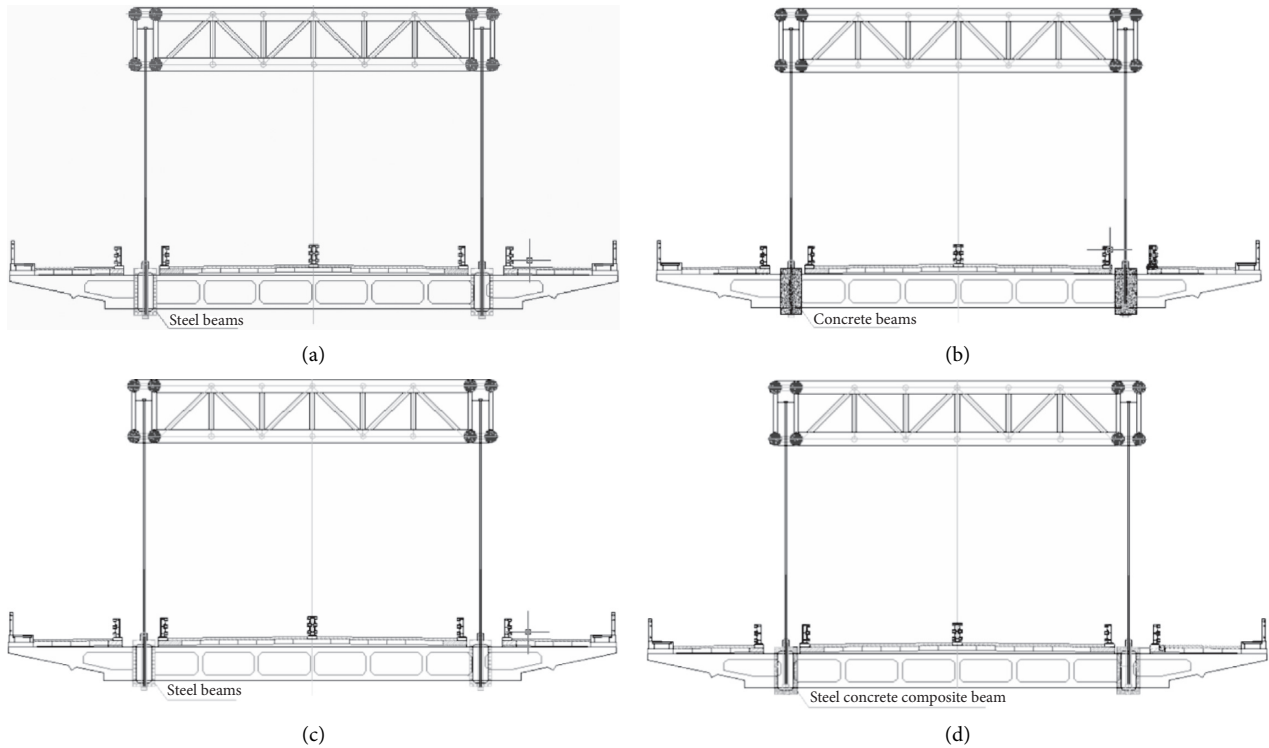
Bridge reinforcement schemes. (a) Scheme 1: replace the overall bridge deck. (b) Scheme 2: add longitudinal concrete beams. (c) Scheme 3: add longitudinal steel beams. (d) Scheme 4: add longitudinal steel box-concrete composite beams.
